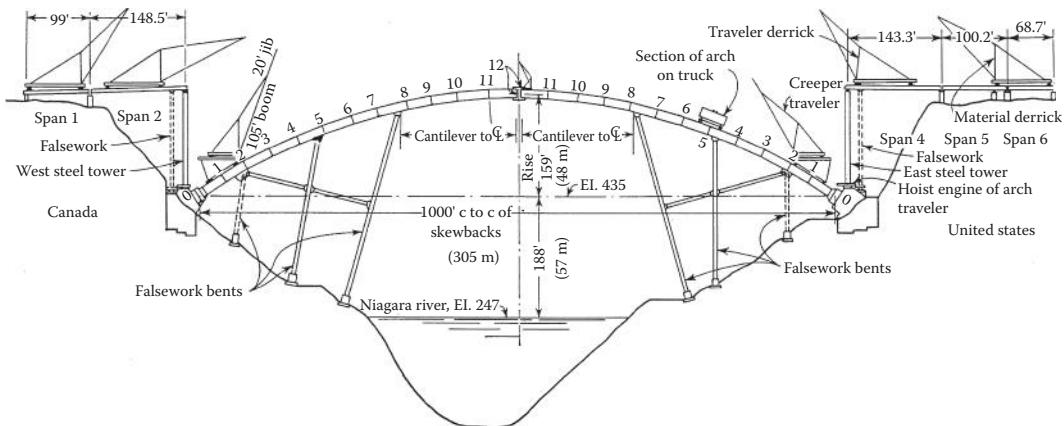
Lewiston–Queenston arch bridge near Niagara Falls, New York. Crawler cranes erect steelwork for spans 1 and 6 and erect material derricks thereon. These derricks erect traveler derricks, which move forward and erect supporting falsework and spans 2, 5, and 4. Traveler derricks erect arch-rib sections 1 and 2 and supporting falsework at each skewback, then set up creeper derricks, which erect arches to midspan.
